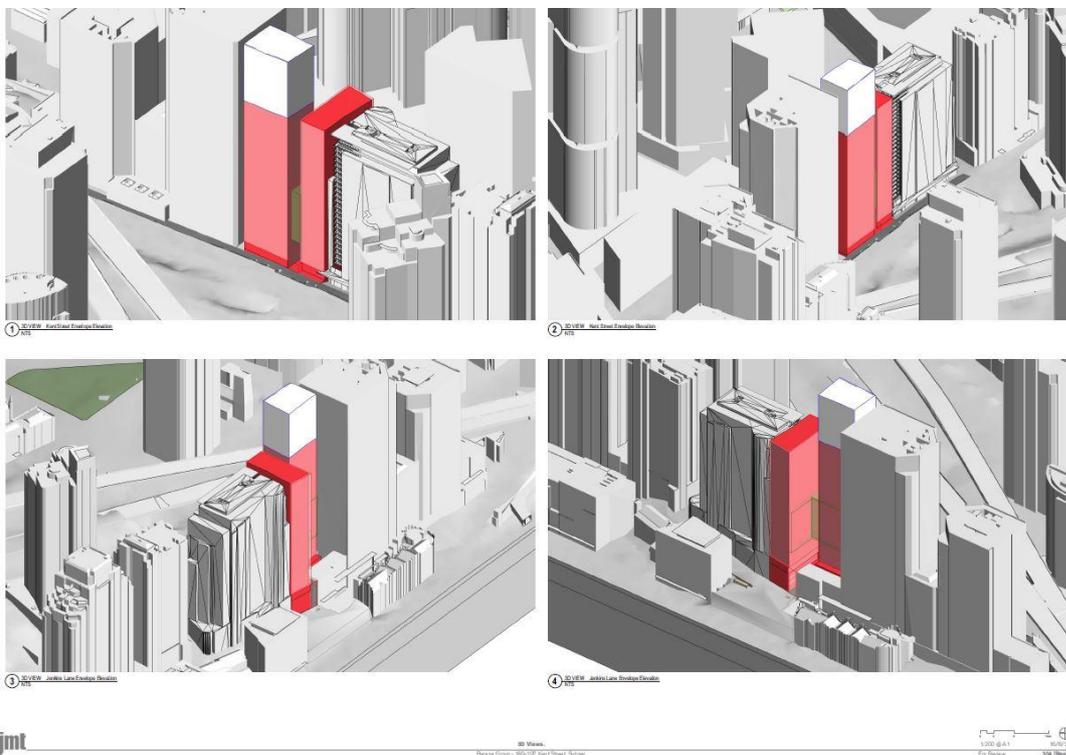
Axonometric envelope views, depicting the approved envelope (shaded pink and red), the proposed envelope addition (shaded white) and the envelope area to be deleted (shaded green)
